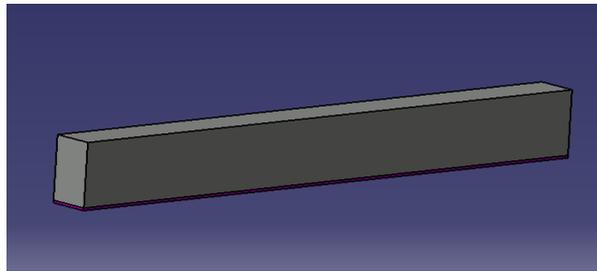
Reinforcement of the lower side of concrete beams with TRM and FRCM materials
